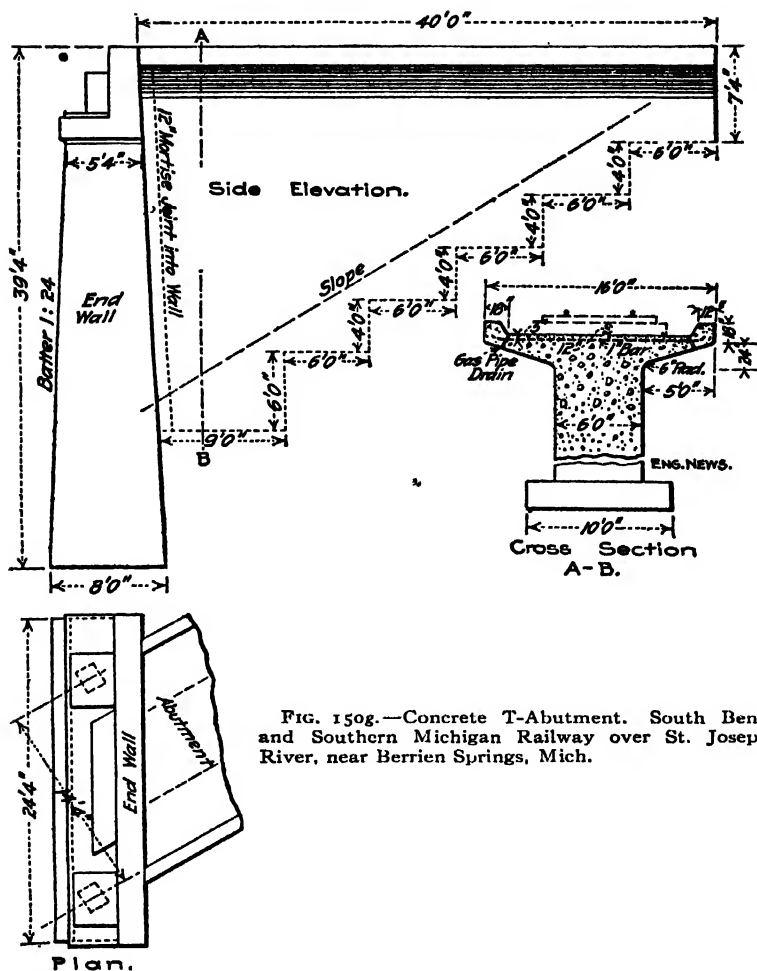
Concrete T-Abutment. South Bend and Southern Michigan Railway over St. Joseph River, near Berrien Springs, Mich.
